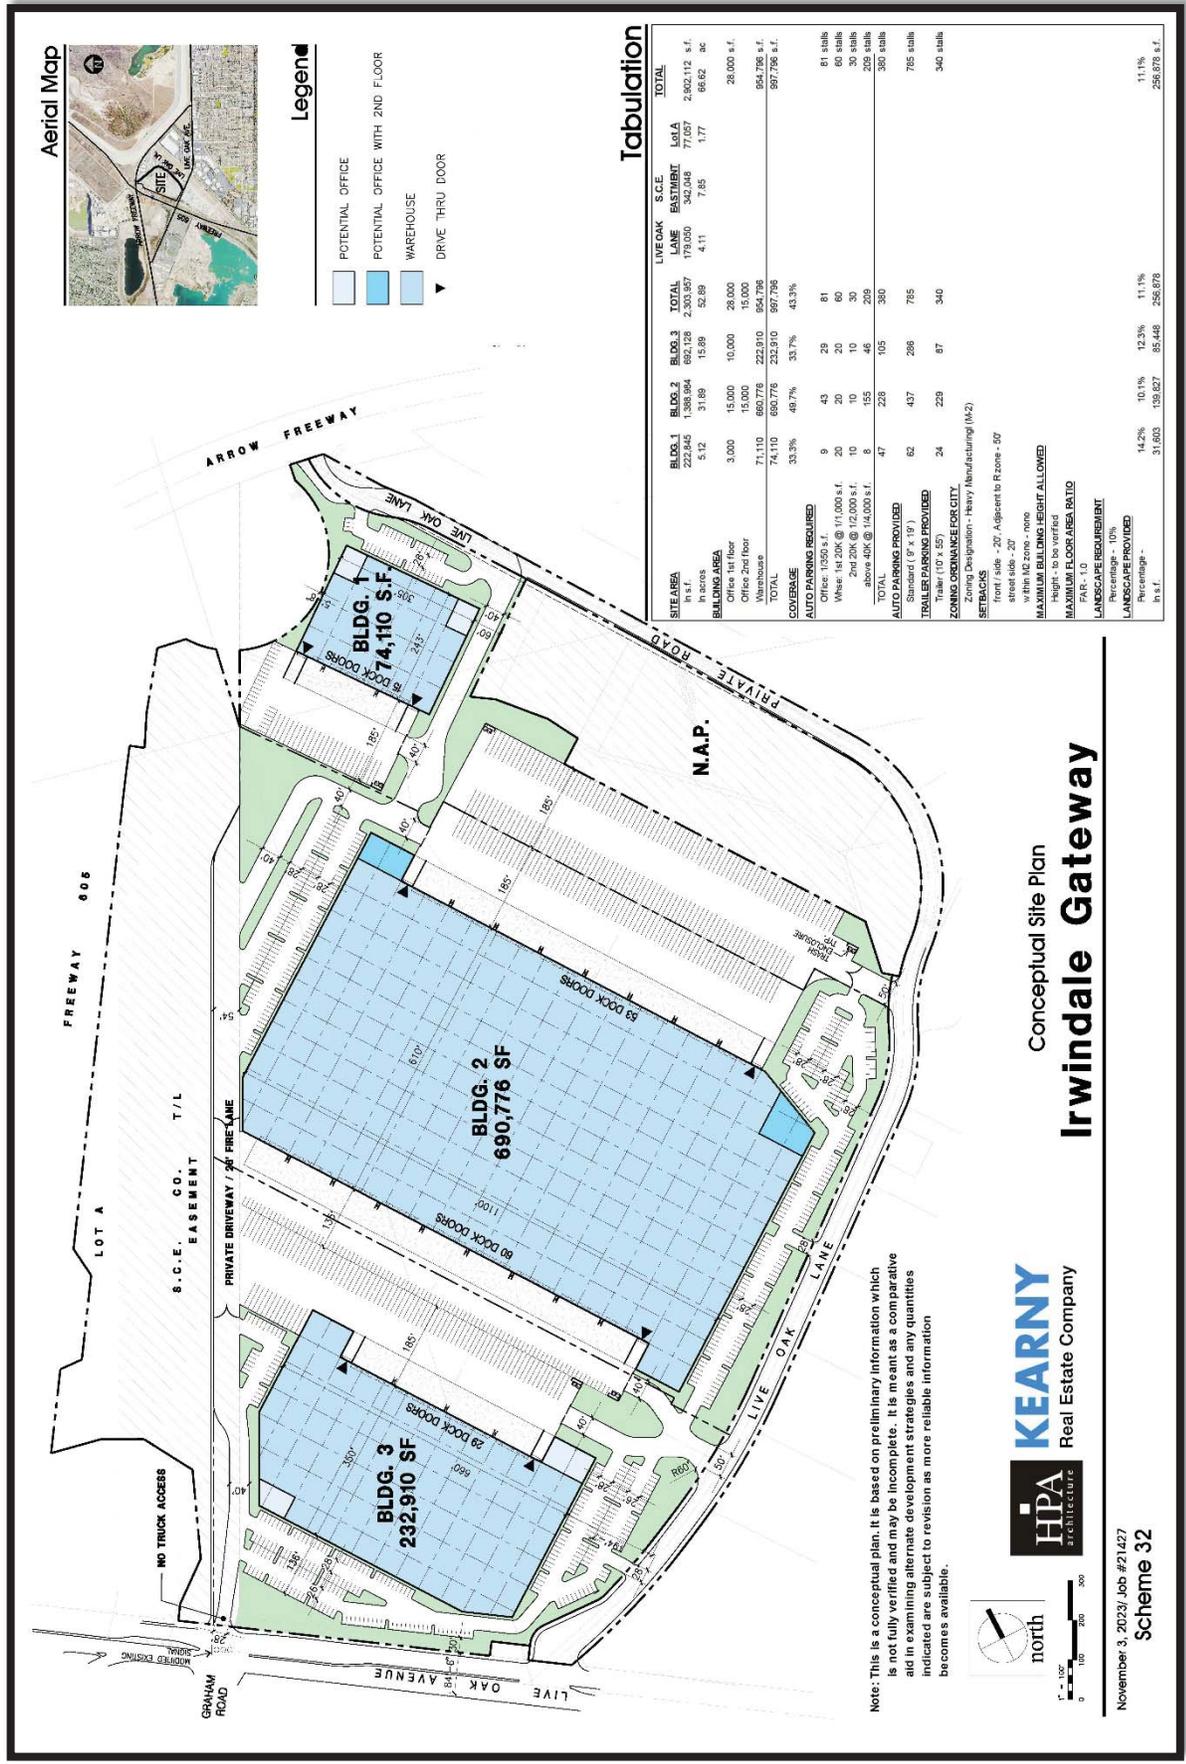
CONCEPTUAL SITE PLAN ~~WITHOUT-BESS~~
